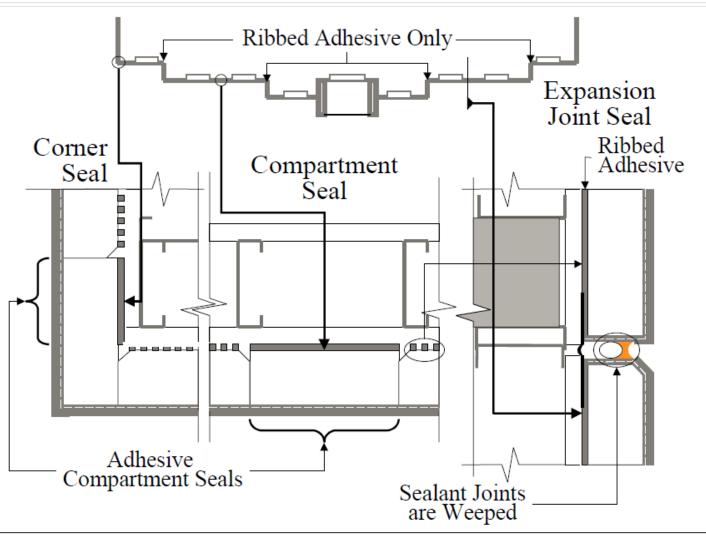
Compartment Details for Front Elevation (Shown in Plan View from Top)
